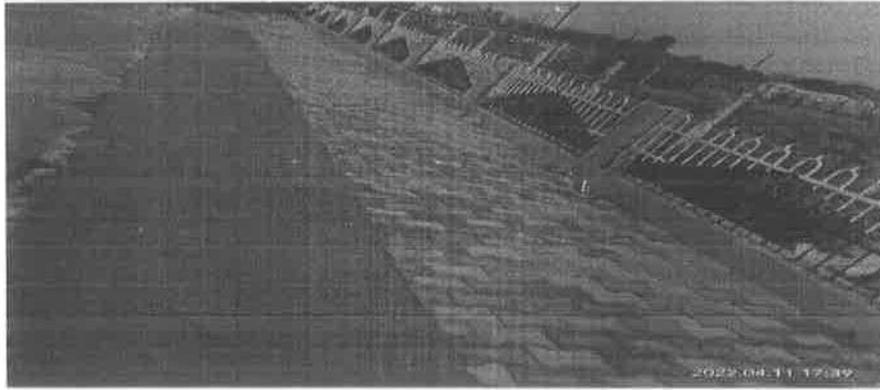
Renovation work on the premises of the Collector office at Janjgir-Champa.
